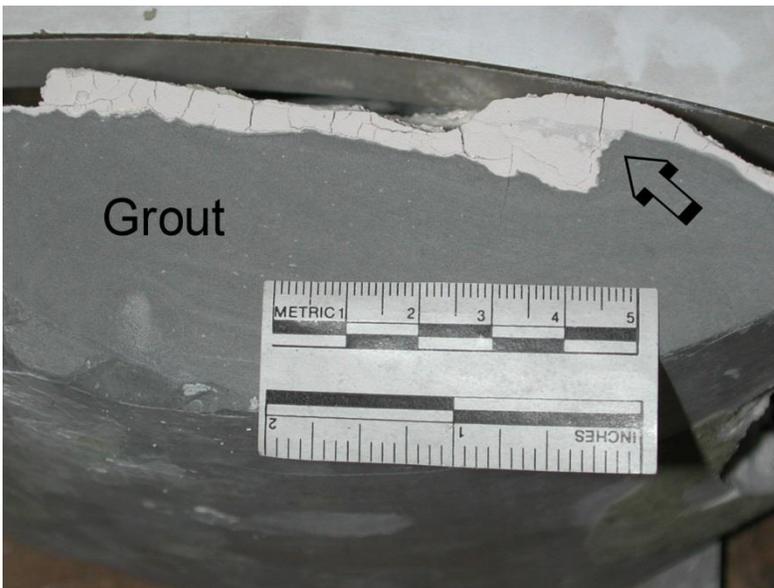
A cross section of backfill grout showing replacement of cement grout with thaumasite, a form of sulfate attack.
